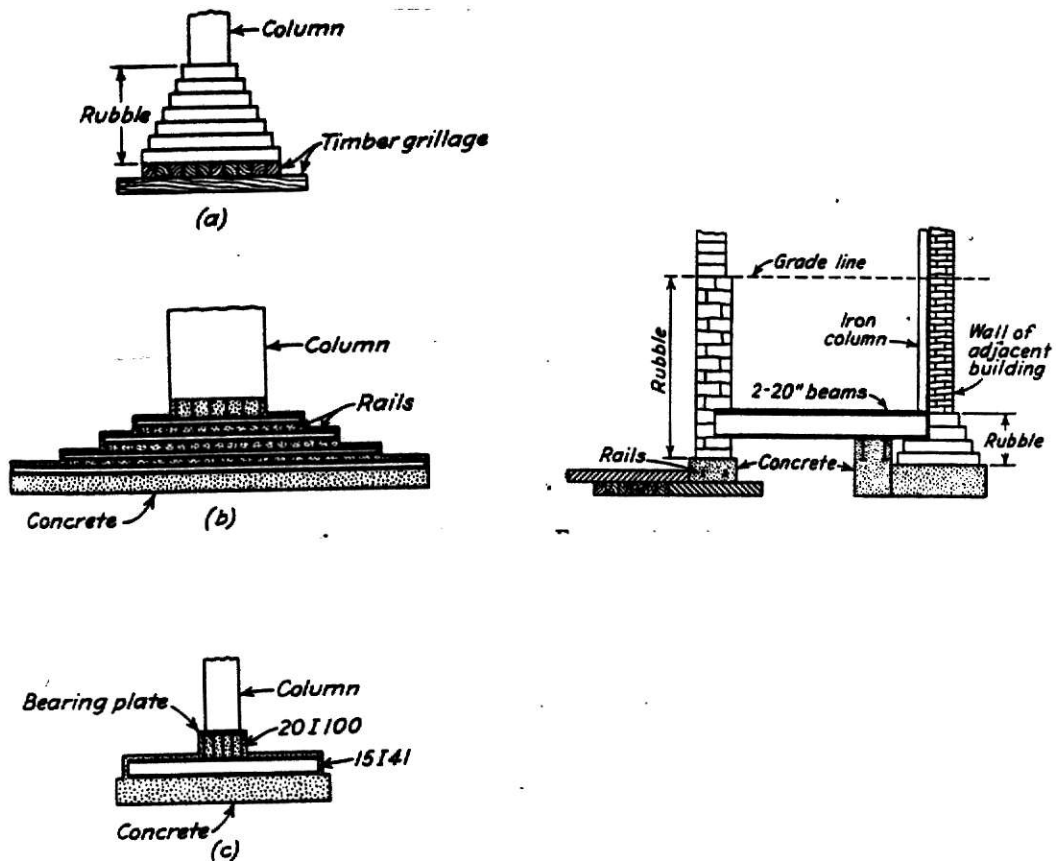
Historical development of grillage foundations of (a) timber, (b) railroad rails, (c) steel I-beams, (d) Cantilever footing supporting exterior column of Auditorium Building, Chicago, 1887.
